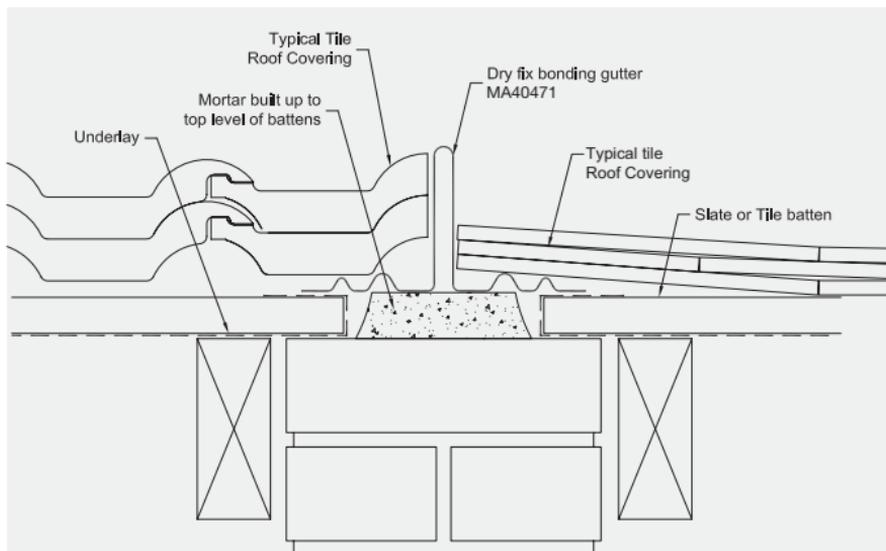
Typical firebreak installation showing high profiled interlocking tiles abutting slates, using MA40471
